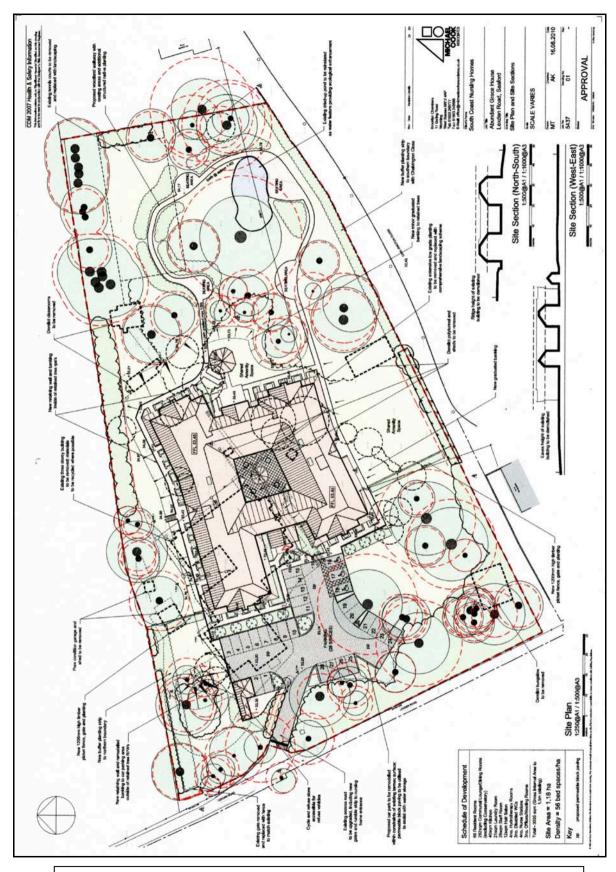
Abundant Grace House Site, Seaford: Development Plan (Adapted from architects plan)
